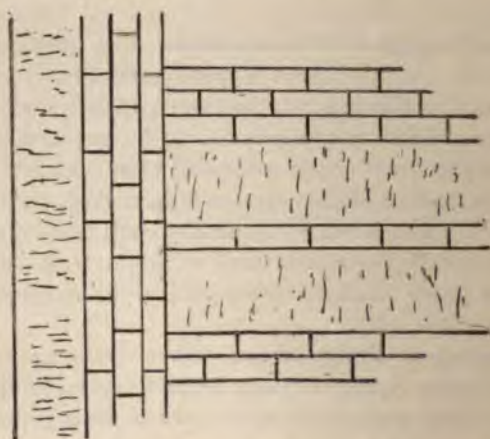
PLAN OF CROSSING-STONES AND GUTTER-PAVING.
